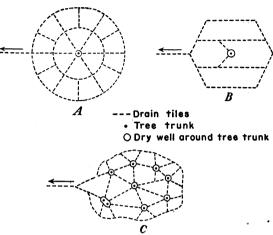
Arrangement of drain tile on original surface of ground where a fill is to be made. The tiles are placed so as to drain in the direction indicated by arrows. A, Tiles laid in lines radiating from tree trunk and connected to drain off water at outlet. Center of pattern only may serve for a small tree; for larger trees additional drainage may be provided by extending the tiling as indicated. B, Parallel lines of tiles somètimes may be used advantageously. C, Suggested arrangement of tile drains for a group of trees.
